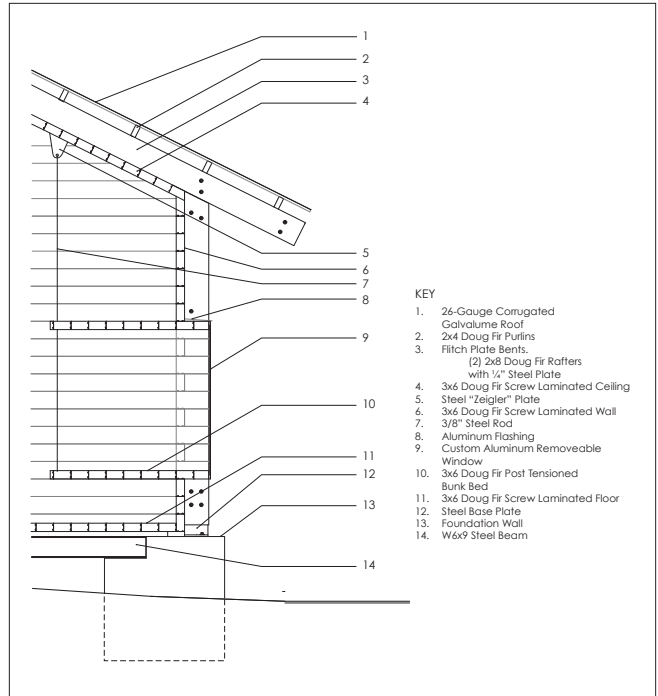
Screw Laminated Timber (SLT) wall section and hanging bunk bed detail . Image credit CU Denver.
